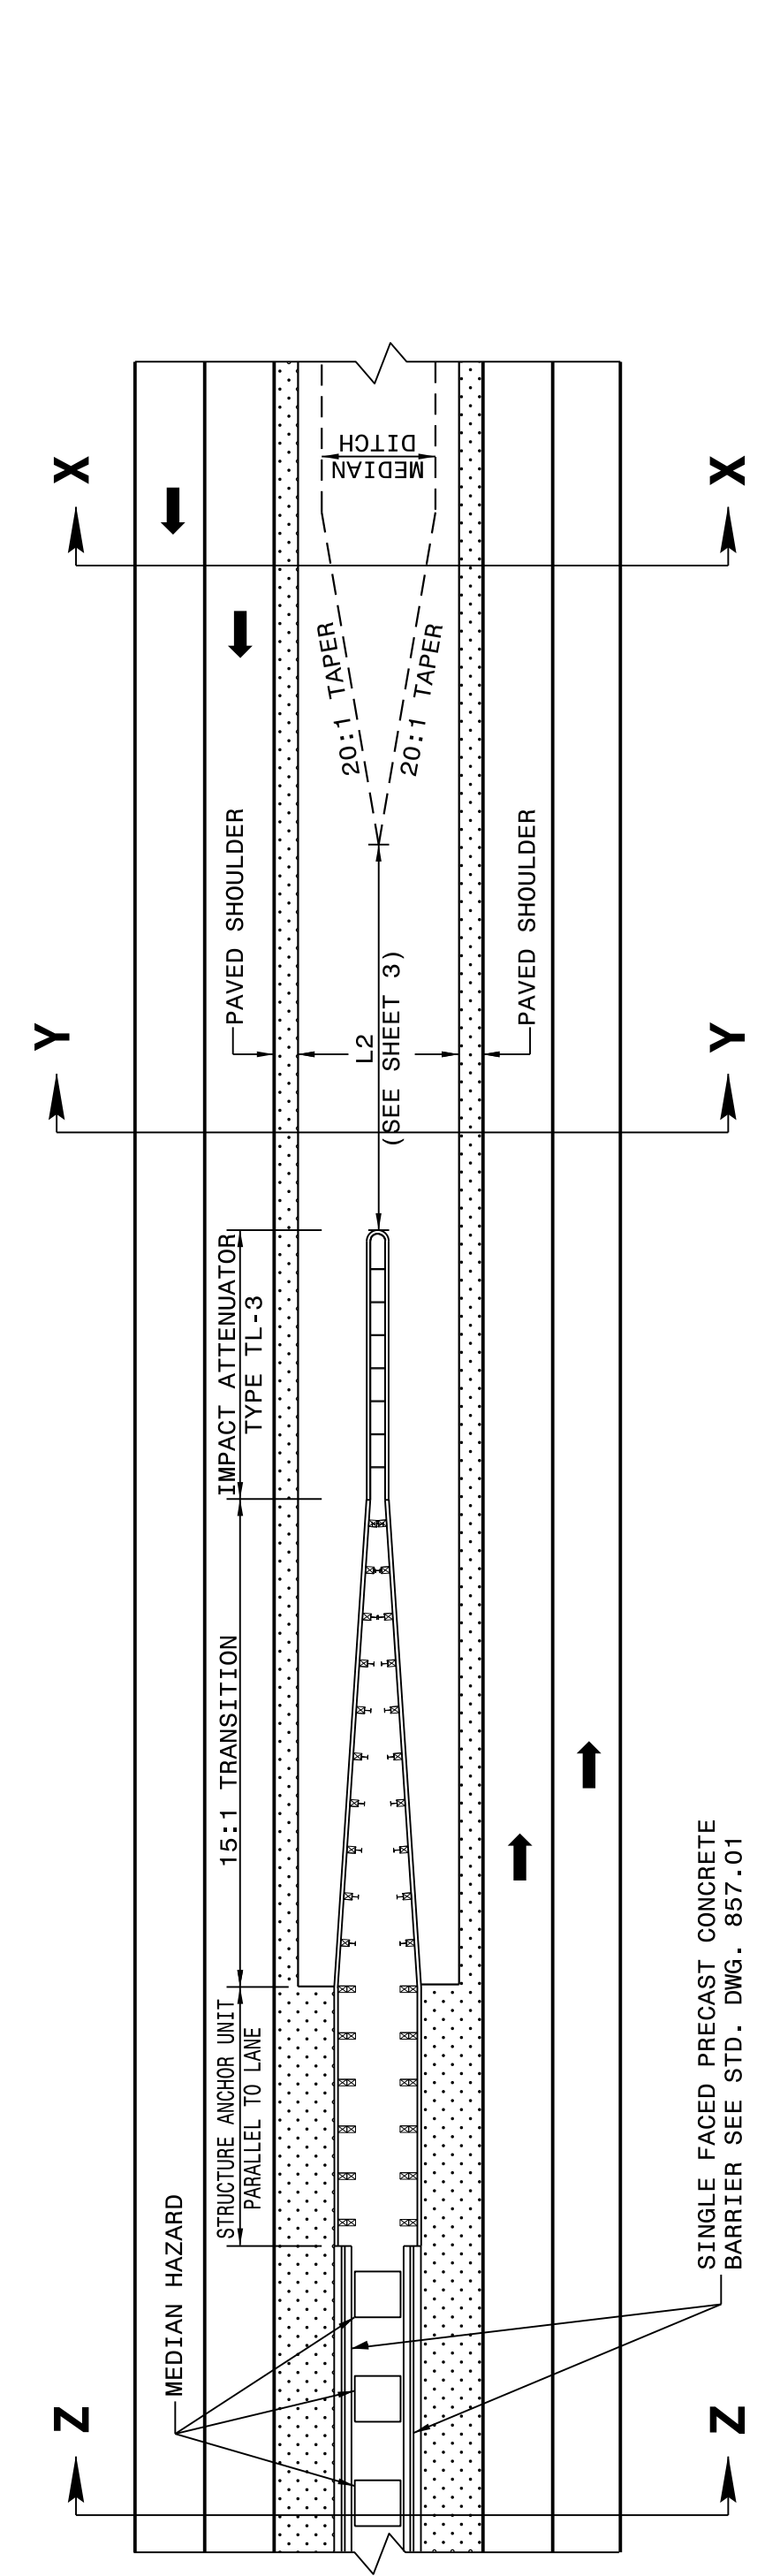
DETAIL OF GUARDRAIL AT MEDIAN SIGN SUPPORT
